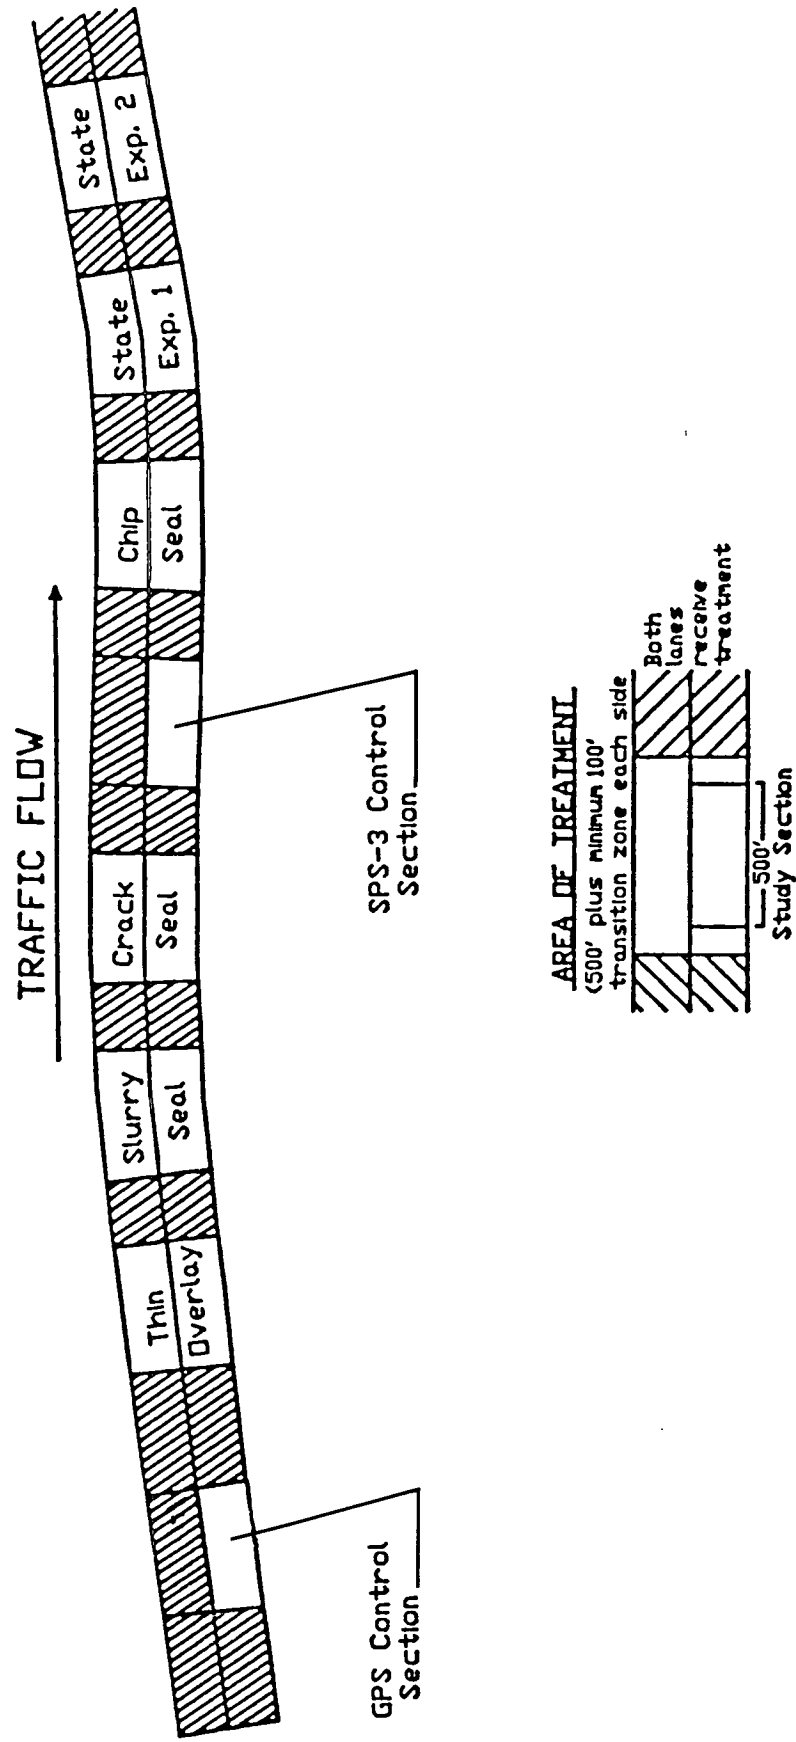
Layout of SPS-3 test sections for flexible pavements. Each test site has five test sections, including an untreated control section.
